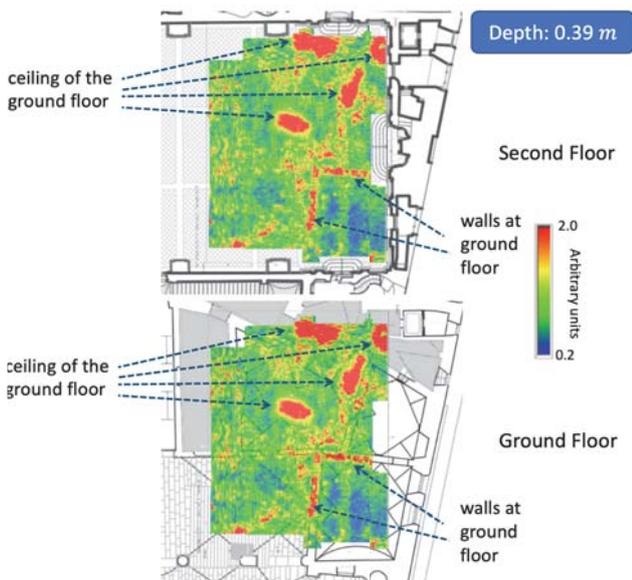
C-scan at 0.39 m superimposed to the maps of the second floor and the ground floor
